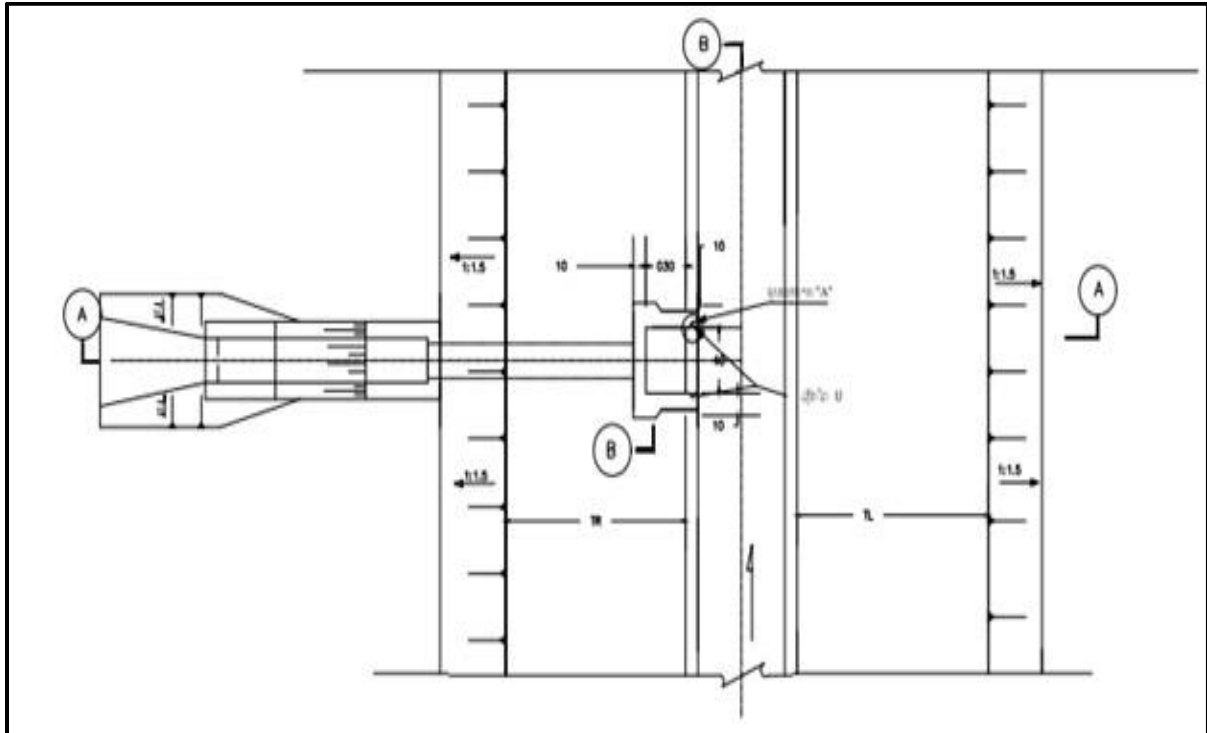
TYPICAL CROSS SECTION OF CANALS AND CANAL ELEMENTS
